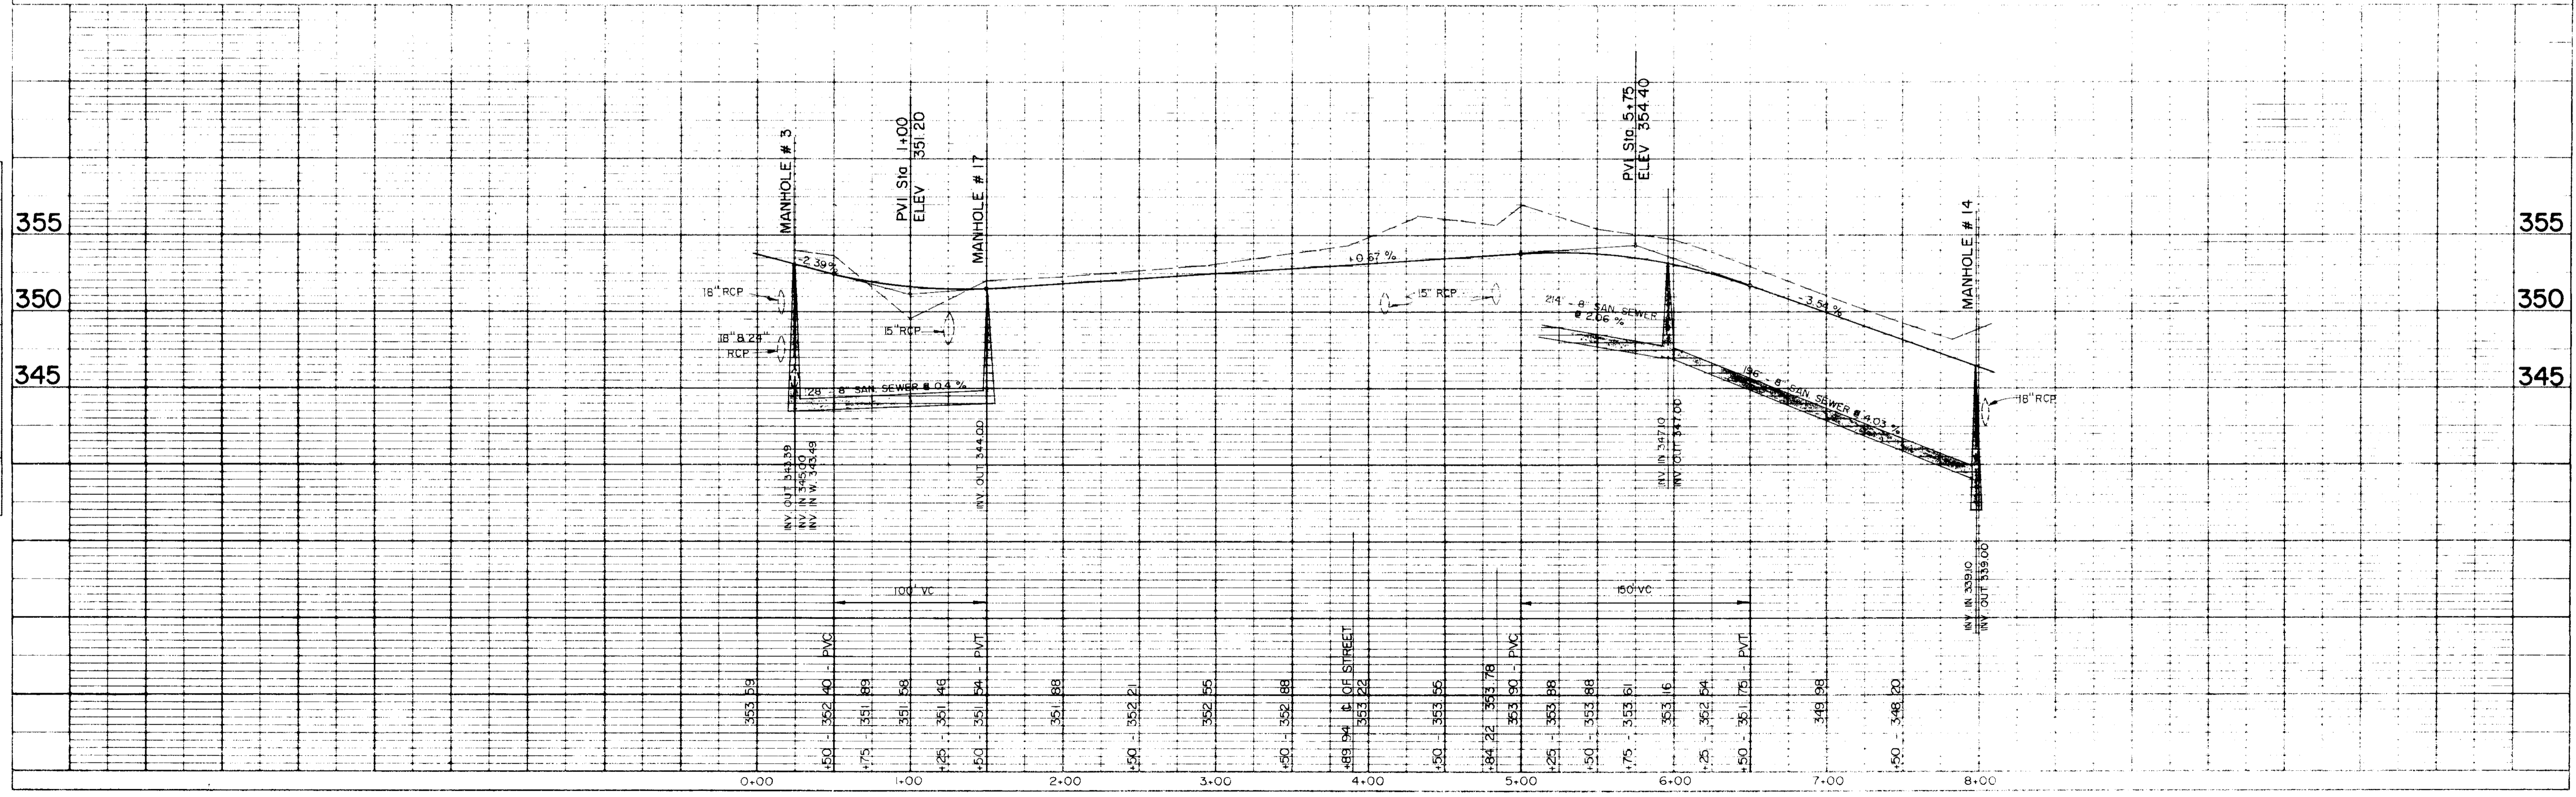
SINGLE PLAN AND PROFILE-FULL LINE
